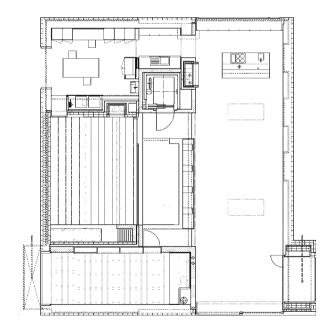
Plan of 2nd floor The small apartment and the penthouse share the 2nd floor.
